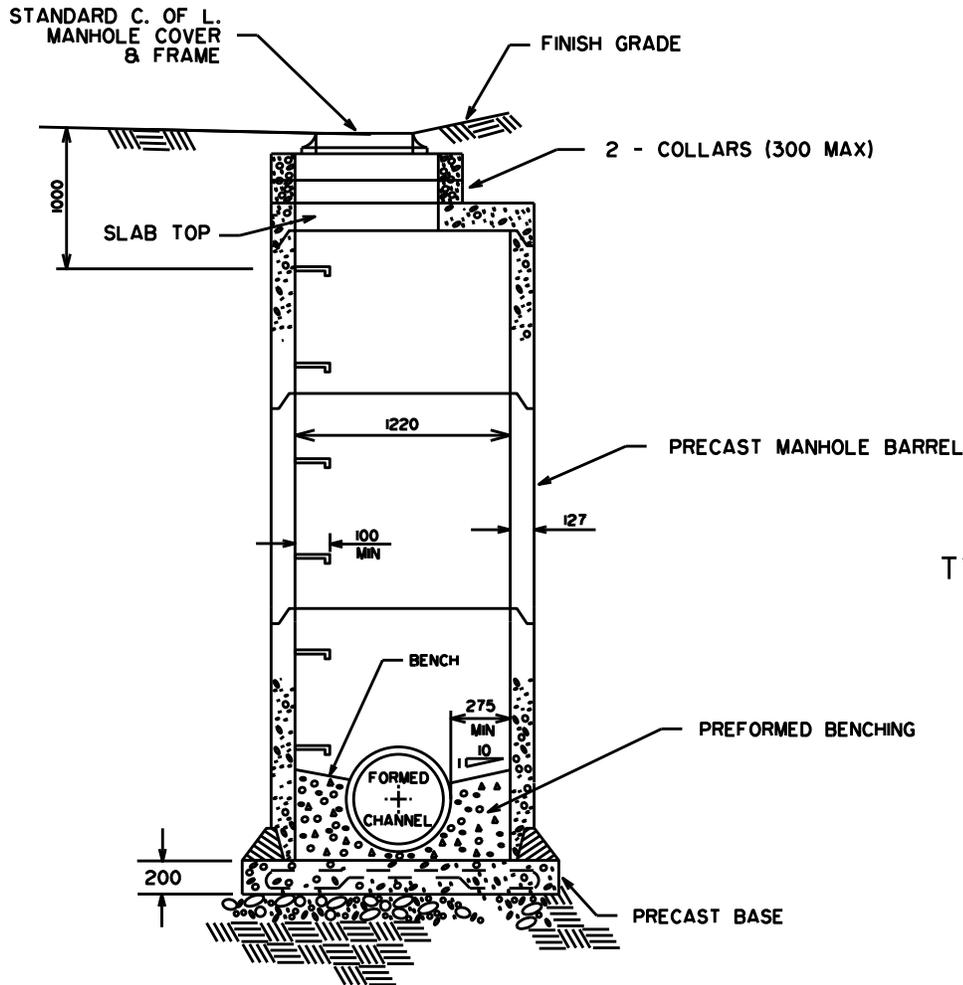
DETAILED ENGINEERING STANDARDS – WASTEWATER COLLECTION AND STORM DRAINAGE SYSTEMS
